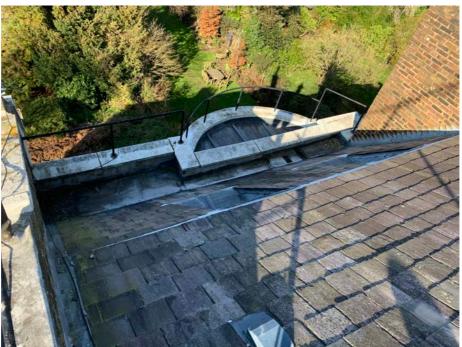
Parapets to rear, with lower in-situ concrete coping to bay.
